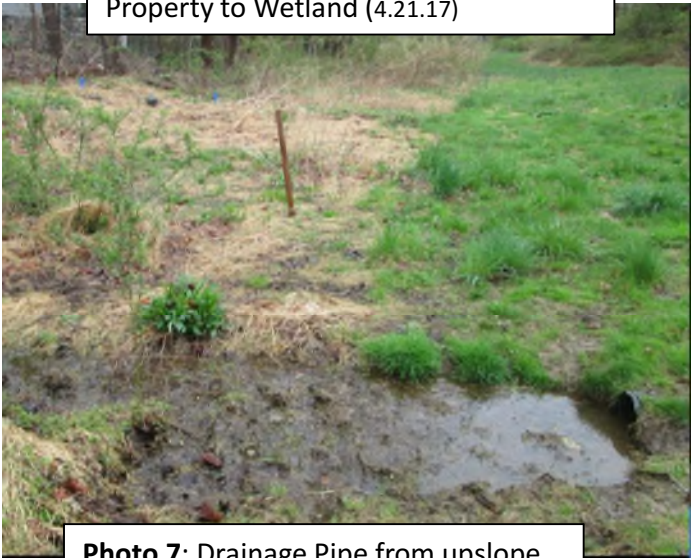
Drainage Pipe from upslope onsite parcel to Wetland (4.21.17)
